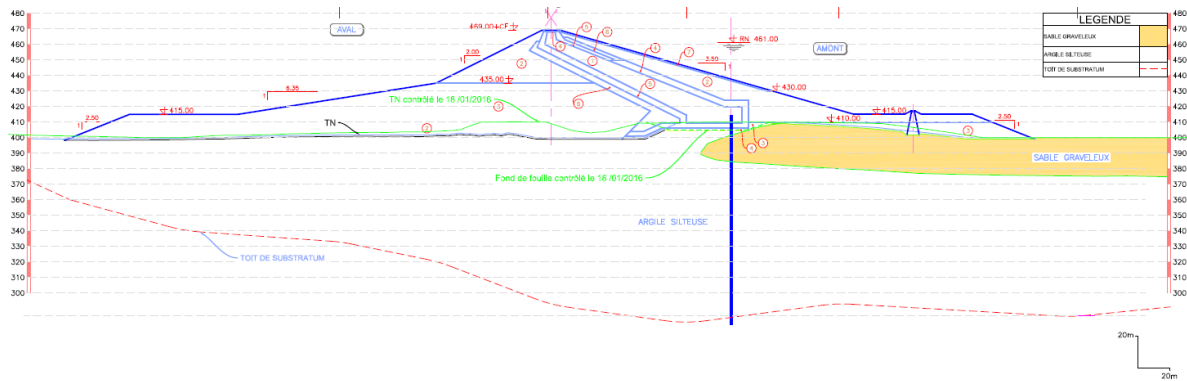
Typical cross-section of Bisri dam (pre-existing colluvium is not represented)
